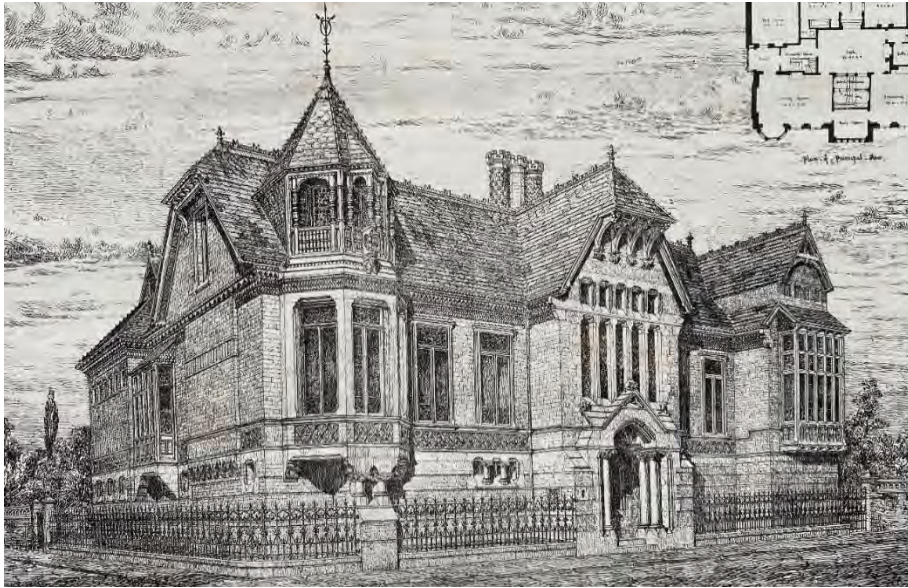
Henry Anthony Bennett's House, Nelson Street, Manchester (1876) (*The Building News*, 8 December 1876)
